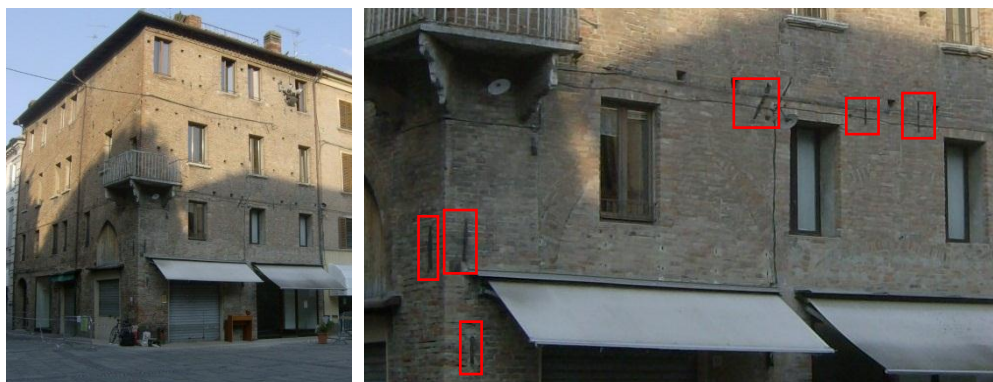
Metallic elements on the façades of the buildings on the corner between Costituente square and Volturmo street in Mirandola
